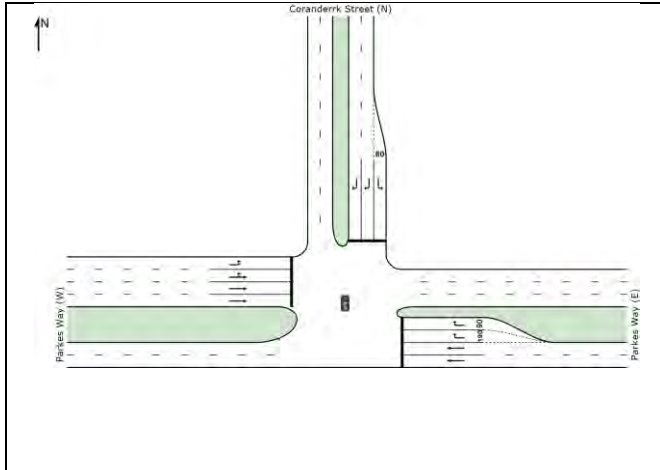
Variant 2c Parkes Way – Coranderrk Street Intersection
